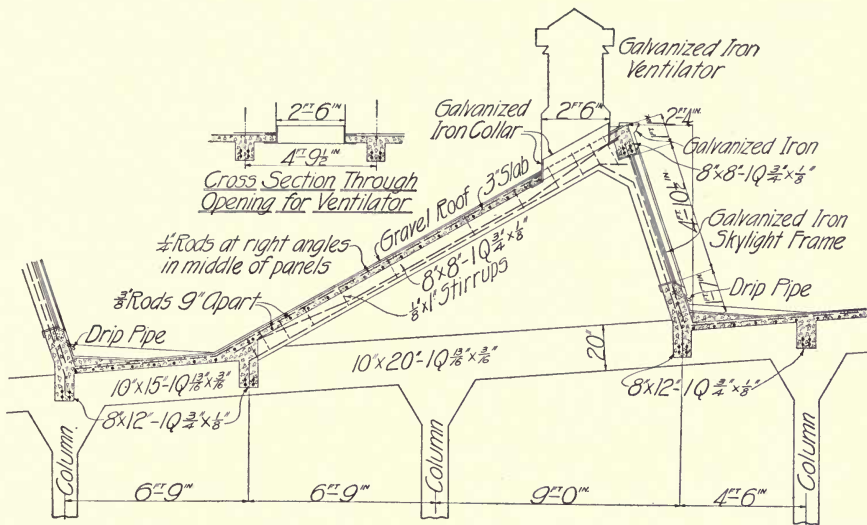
Cross-Section Detail of Saw-Tooth Roof. (See p. 68.)
